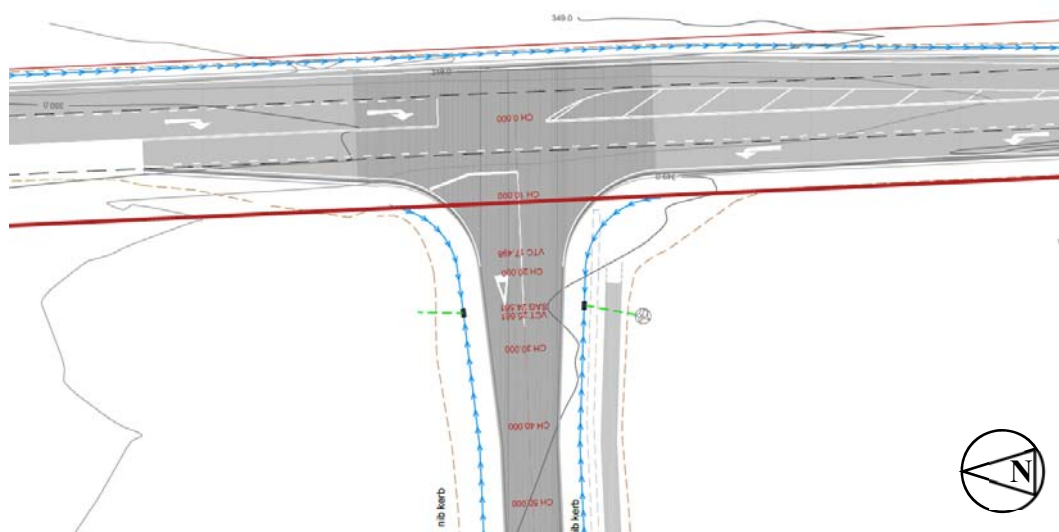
Detail of Proposed Arrowtown – Lake Hayes Road / New Waterfall Park Resort Zone Access Intersection (Extract from Paterson Pitts Drawing 'Proposed Access Road Intersection Detail', Q6388-15 Sheet 3 Rev B)
